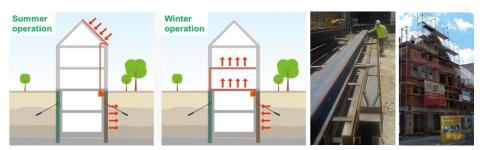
Application of geotechnical elements to activate geothermal energy for buildings, with geothermal probes attached to steel beams ready for installation into the MIP wall, for a dwelling in Füssen, Germany.
